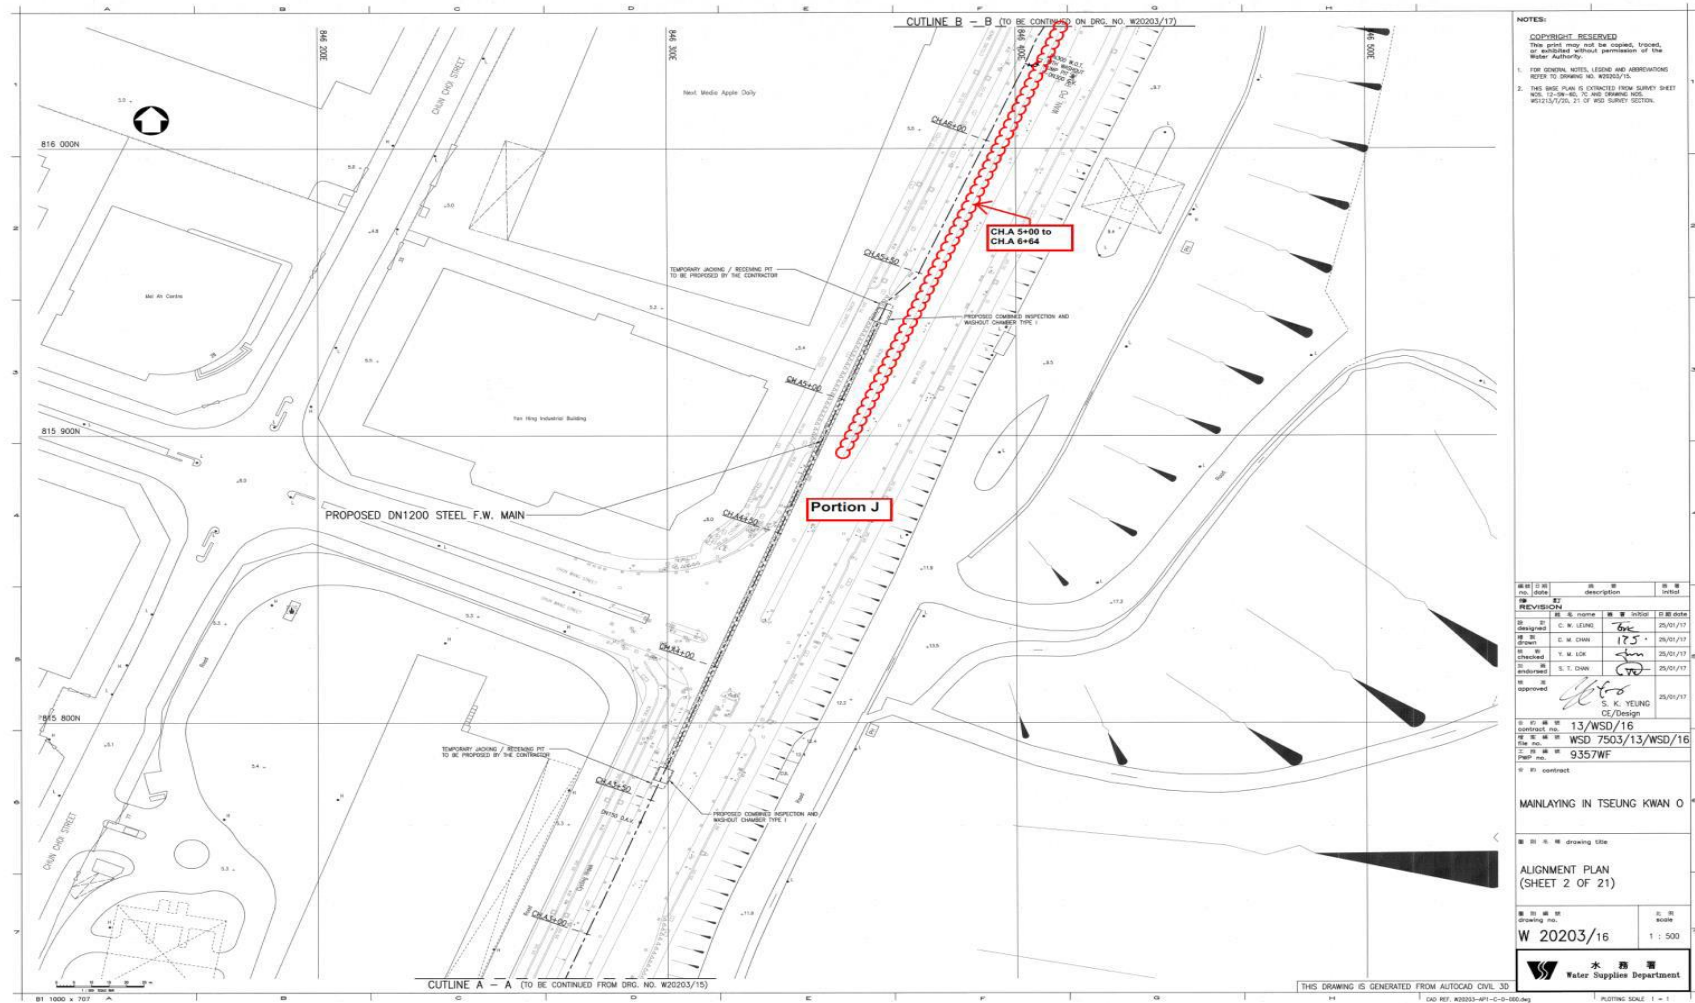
Location Plan for Portion J - CH.A 5+00 to CH.A 6+64
